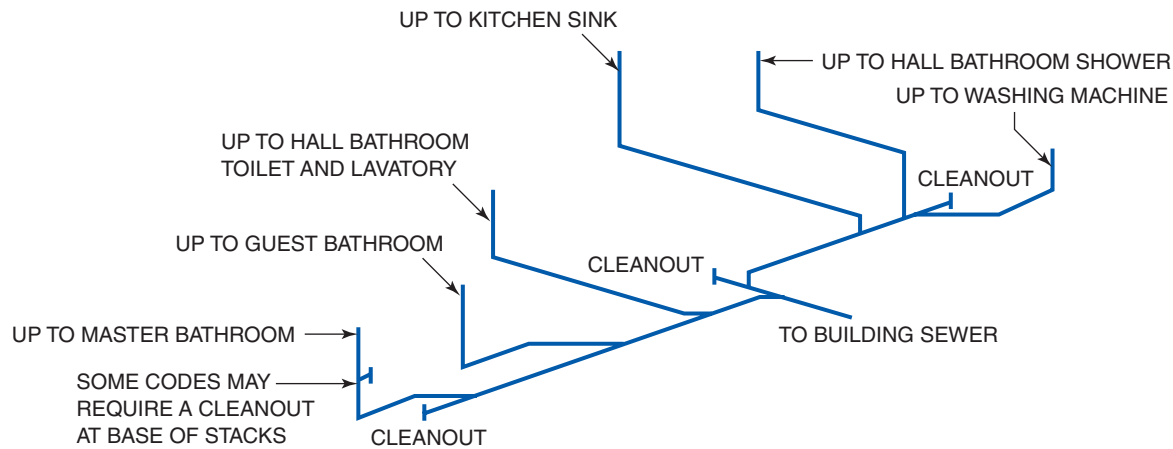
A building drain is the lowest horizontal DWV piping system that connects all other drains to the building sewer.
